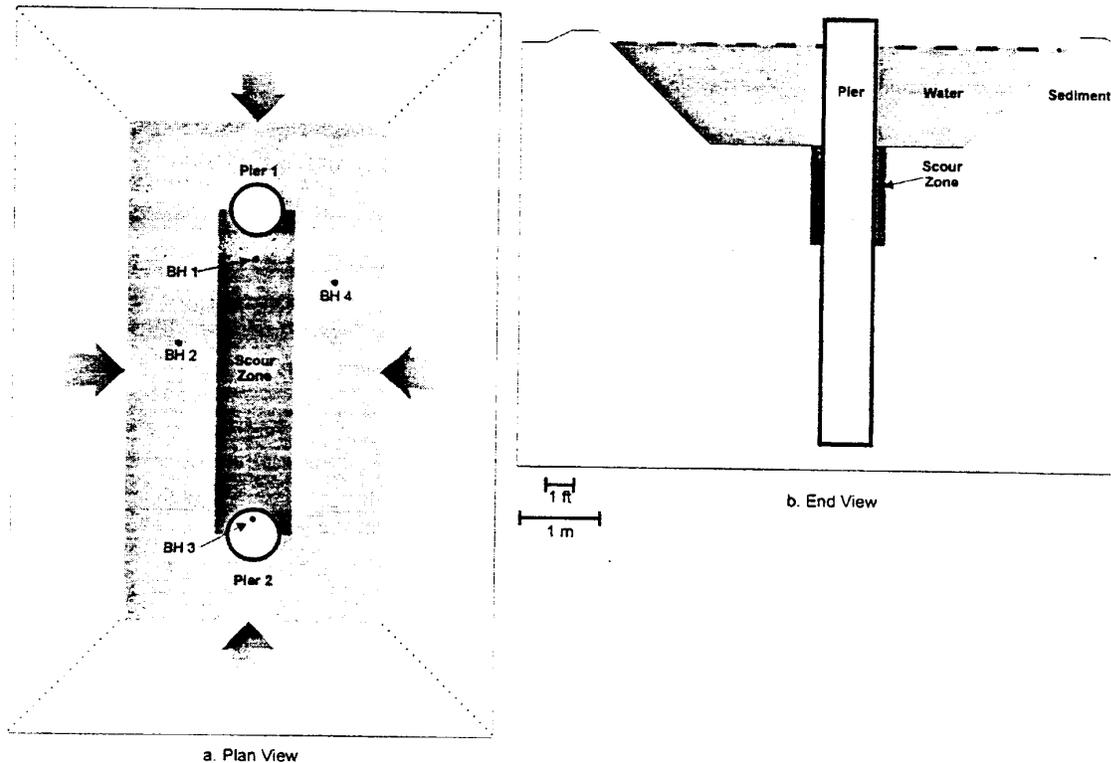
Schematic display of the test site pond. Figure 1(a) is a plan view showing the pond structure and the location of the piers, cased boreholes, and the scour zone. Figure 1(b) is an end view at a pier location.
